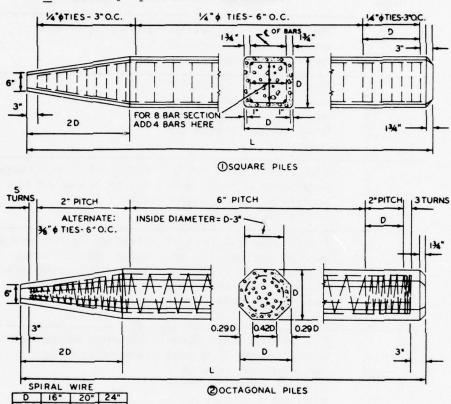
Typical designs for precast concrete piles (from Reference 36)
